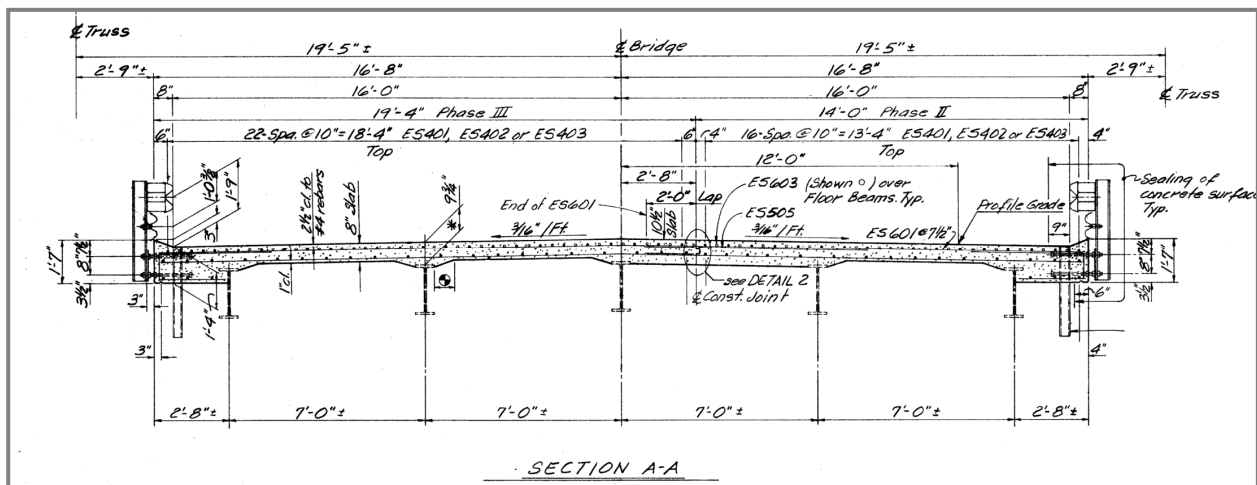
Typical cross section (floorbeam, lower chord, diagonals, and sway braces not shown).
